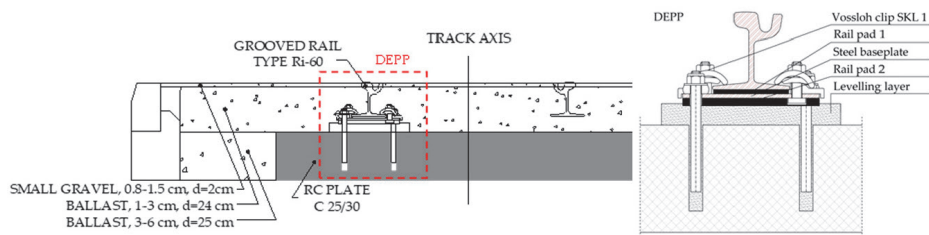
Cross section of the track superstructure with the detail of DEPP fastening system [2]
